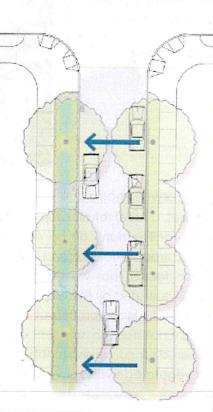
Side Shed Street Profile. Side shed streets are designed to shed all water to one side of the street. GI facilities would be located on the downslope side.
